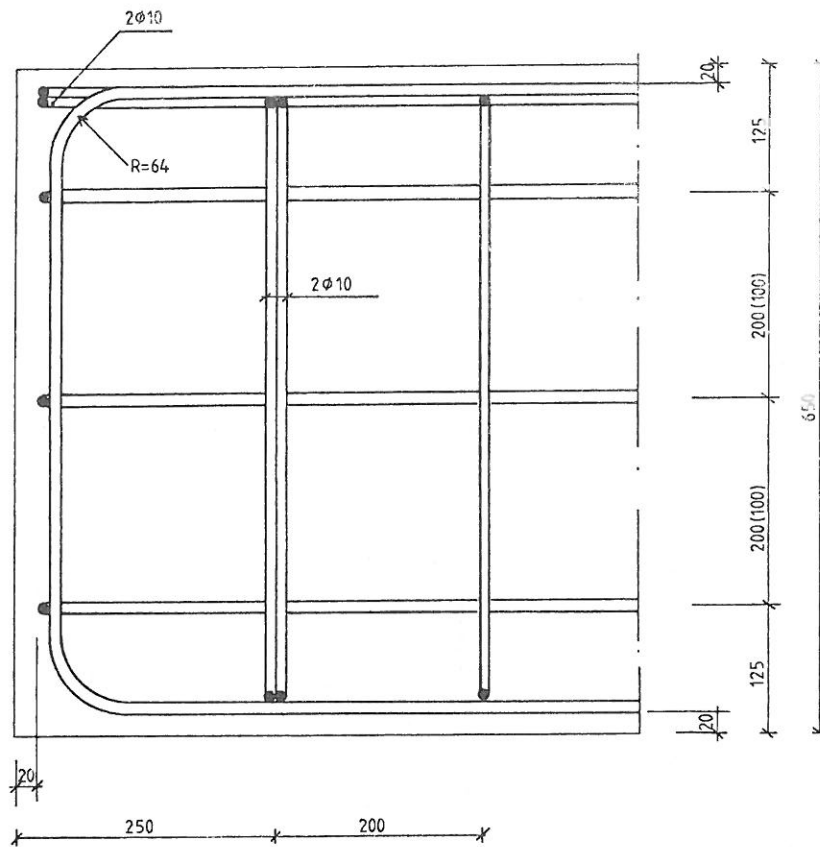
Detail of the reinforcement arrangement in the vertical sides of the foundations
